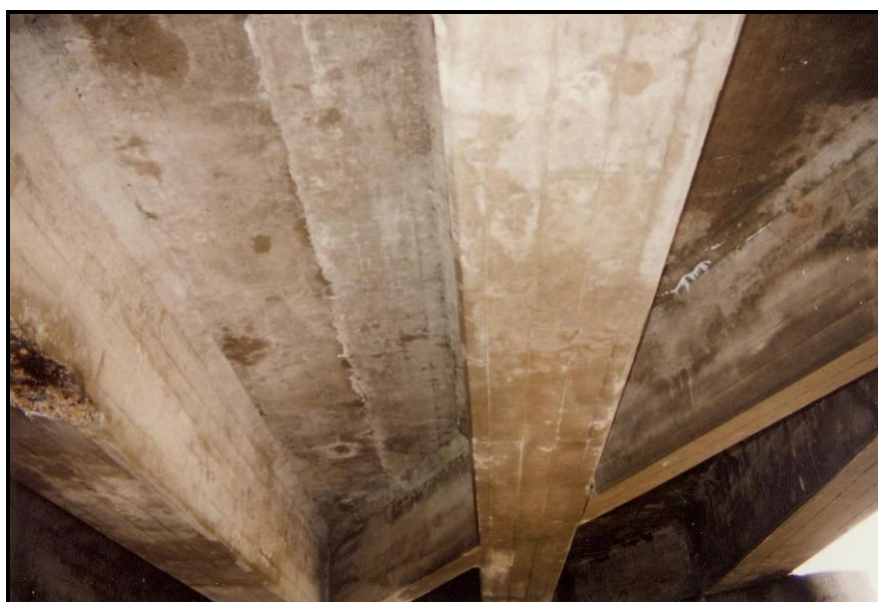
Van Myra Bridge (Bridge 29-050/00-010.65) in Mineral County, constructed in 1921, illustrating a concrete stringer bridge (photograph courtesy of West Virginia Division of Highways)
